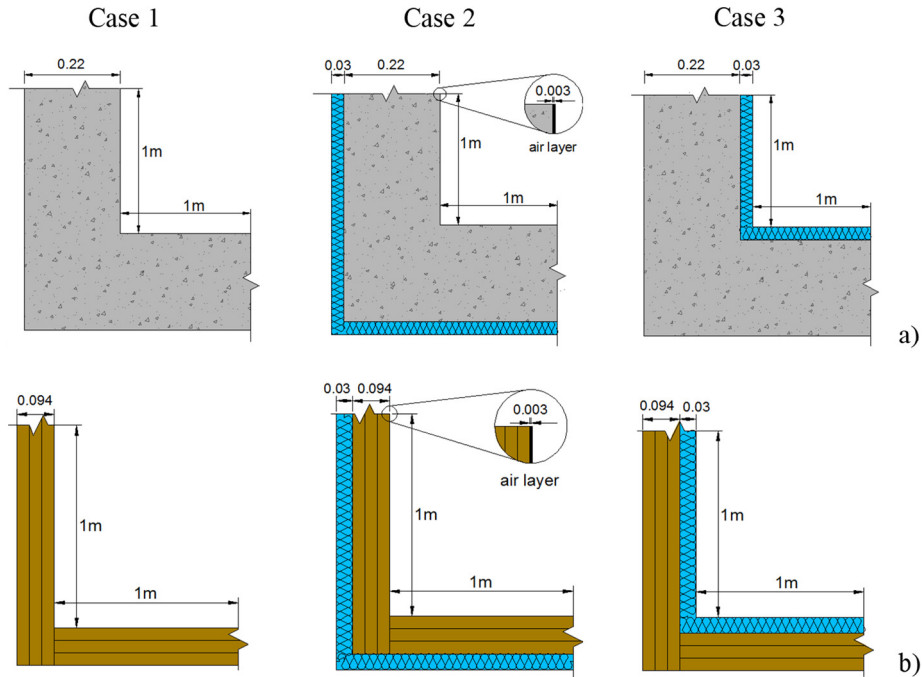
Building corner geometry used in the numerical applications: Case 1 – the wall without any insulation; Case 2 – the wall with a thermal insulation layer on the outside surface; Case 3 - the wall with a thermal insulation layer on the inside surface (dimensions in m). a) Concrete corner; b) Wooden corner.
